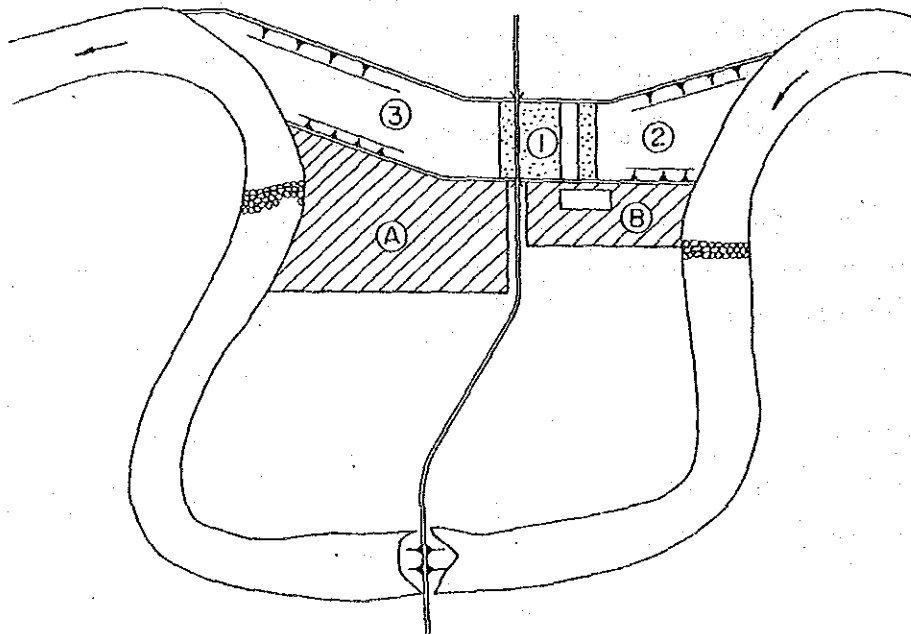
EXPLANATION MAP OF EXCAVATION PLAN
